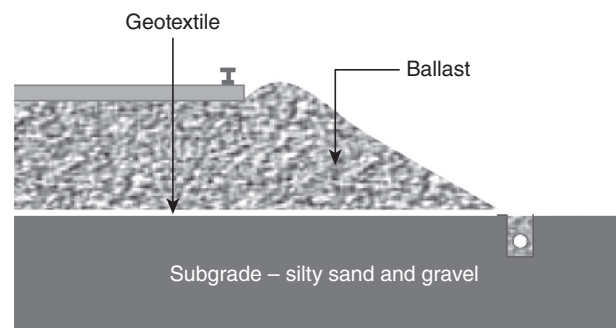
Geotextile between subgrade and ballast in railways. (Courtesy: Terram Geotextiles)
